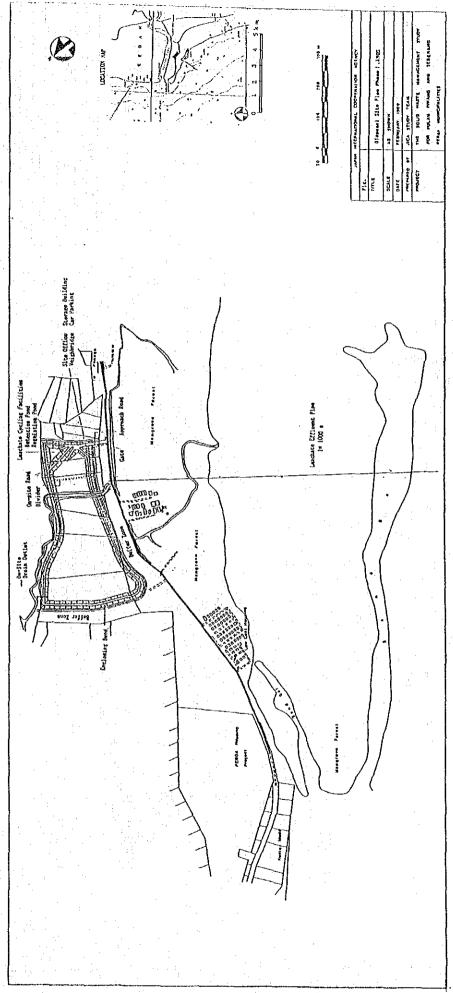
Disposal Site Plan Phase I, KMDS
